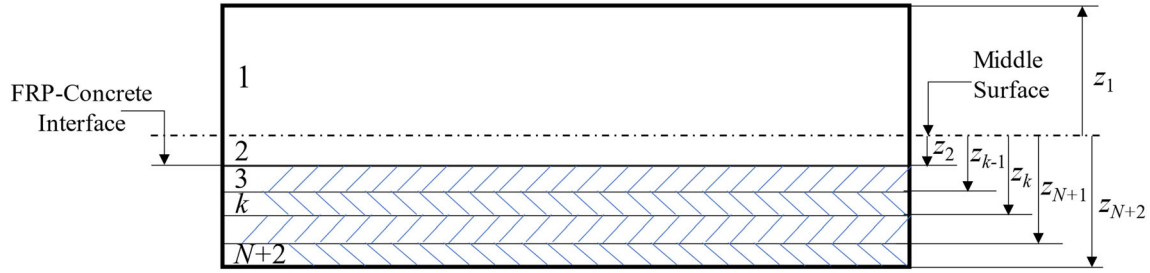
The geometry of concrete wall with N -layered FRP laminate on back-face.
